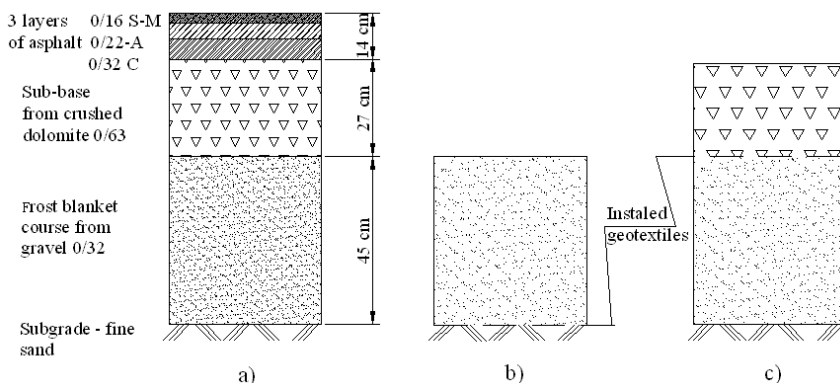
A cross-section of a new road structure and the levels of geotextile installation: a) cross-section of the road structure, b) geotextile separating the subgrade and the frost blanket course, c) geotextile separating the frost blanket course and the sub-base
